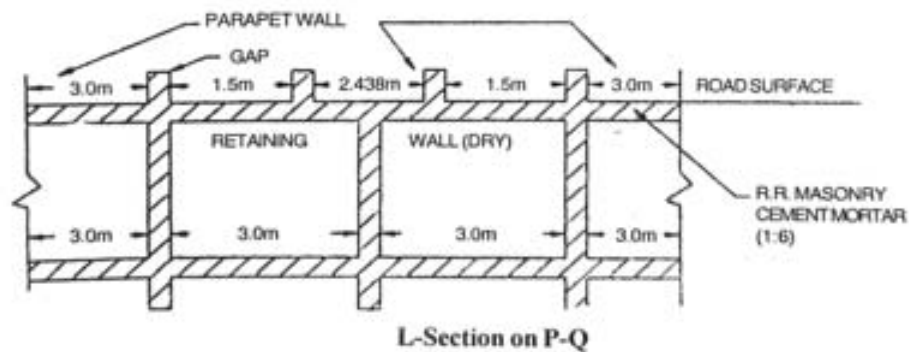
(b): Stones masonry in cement mortar over PCC foundation
